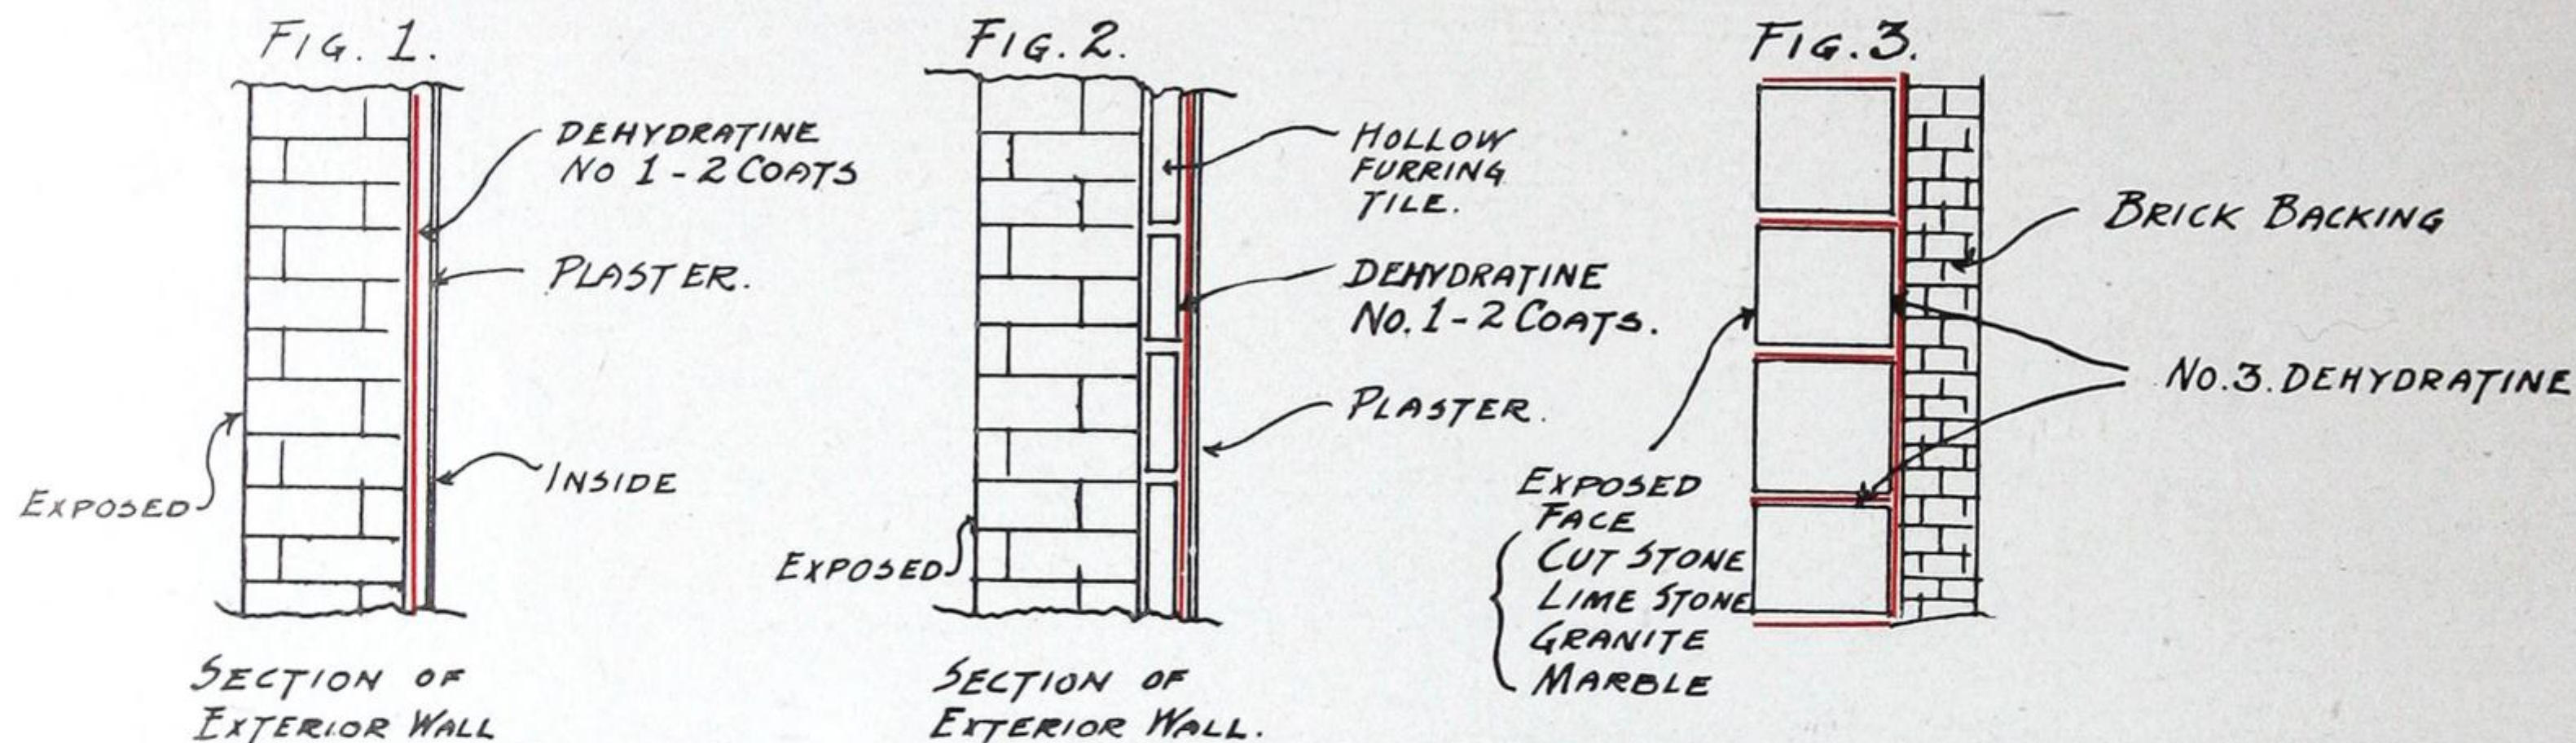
represents section with furring omitted, plastering being done directly upon the damp-proofing, while in Fig. No. 2, where Hollow Tile is employed, the use of No. 1 DEHYDRATINE between it and the plaster prevents staining of the latter.
